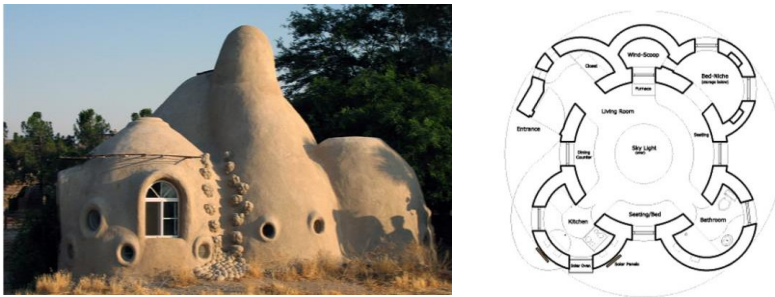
Construction of ceramic houses in America, architect Nader Khalili⁶
